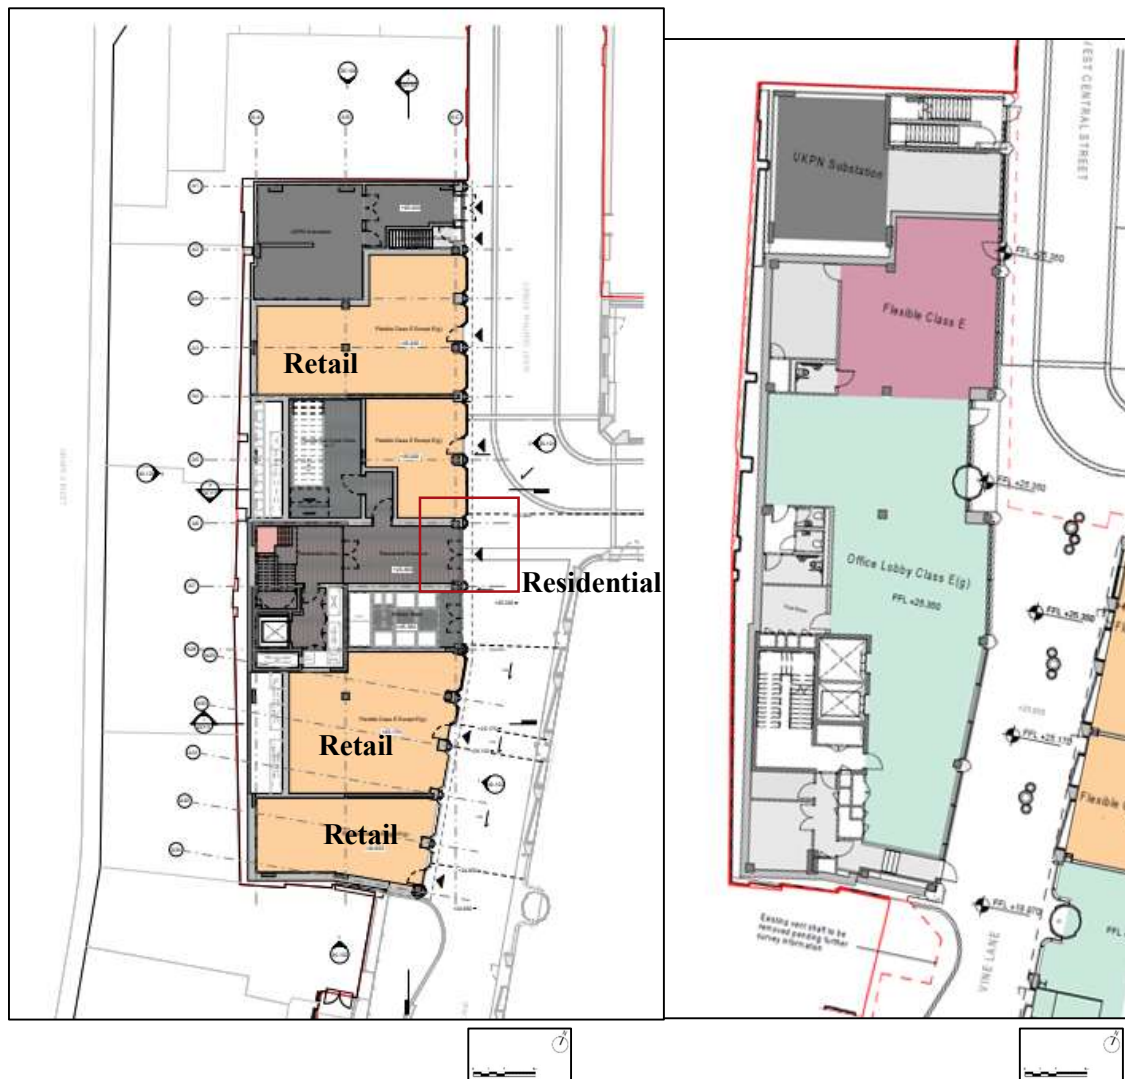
Current (e.g. June 2022) ground floor plan of Vine Lane building (left); previous (e.g. February 2021) ground floor plan of One Museum Street (right)
